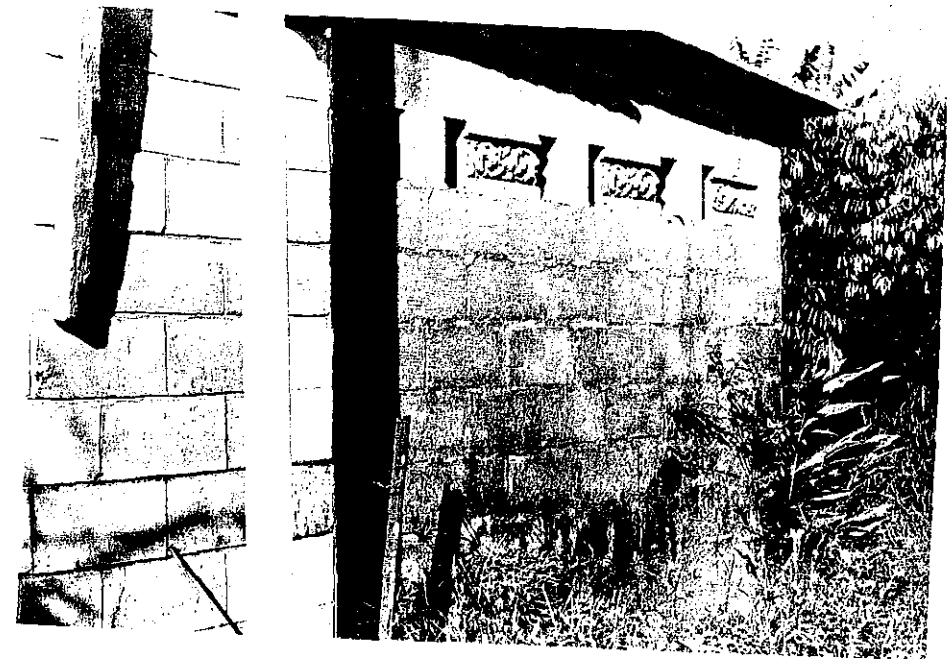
& 84: Borgna concrete barrack (constructed 1927)
